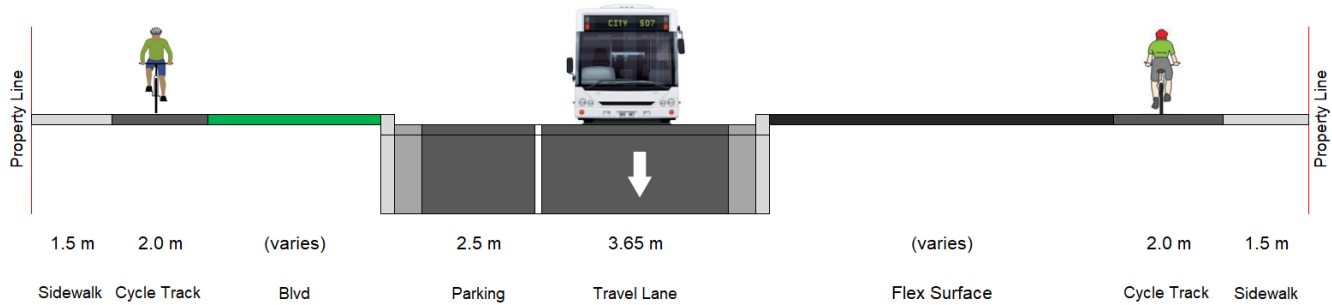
Victoria Avenue – From University Avenue W to Park Street W
